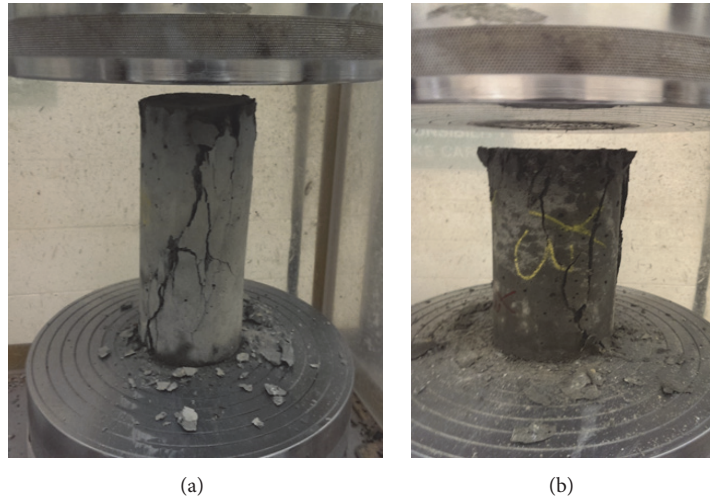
Crack patterns at ultimate failure load: control specimen (a) and specimen (Y3) (b). Reduced cracks in Y3 specimen.
